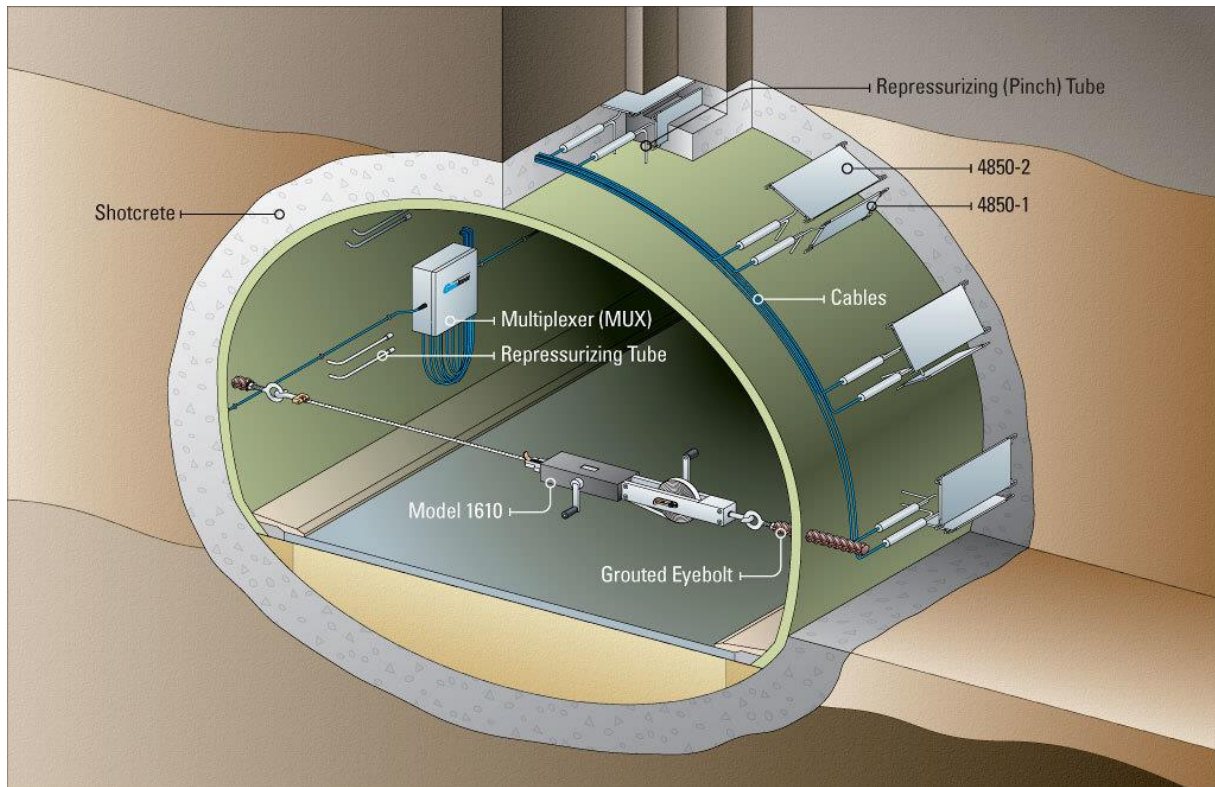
Typical installation of tape extensometer in a tunnel (Geokon, company material)
